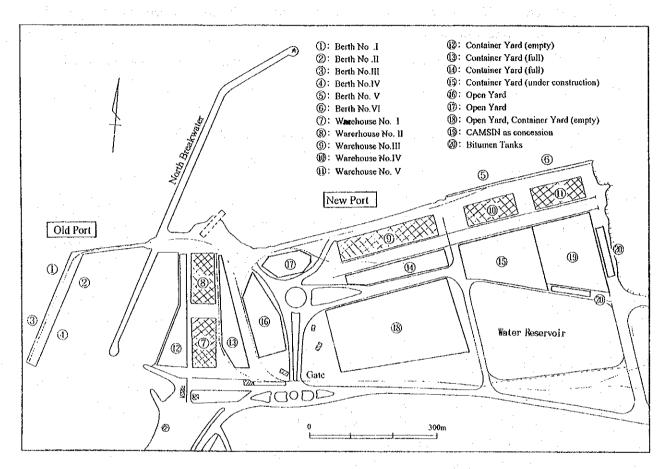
Existing layout of cargo handling facilities
